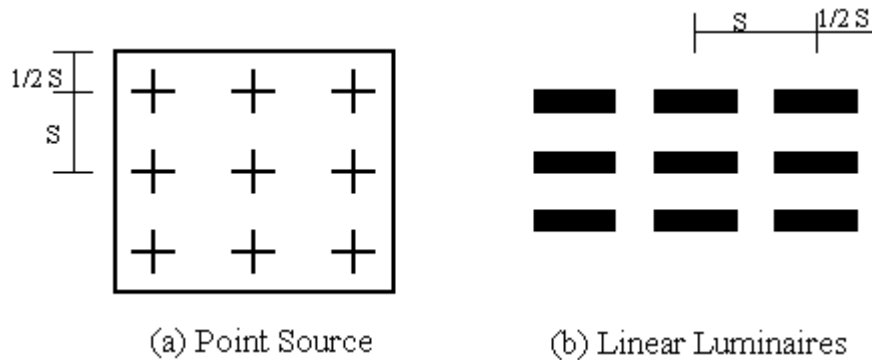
Luminaire Spacing Arrangements (Image Credit: Author)
